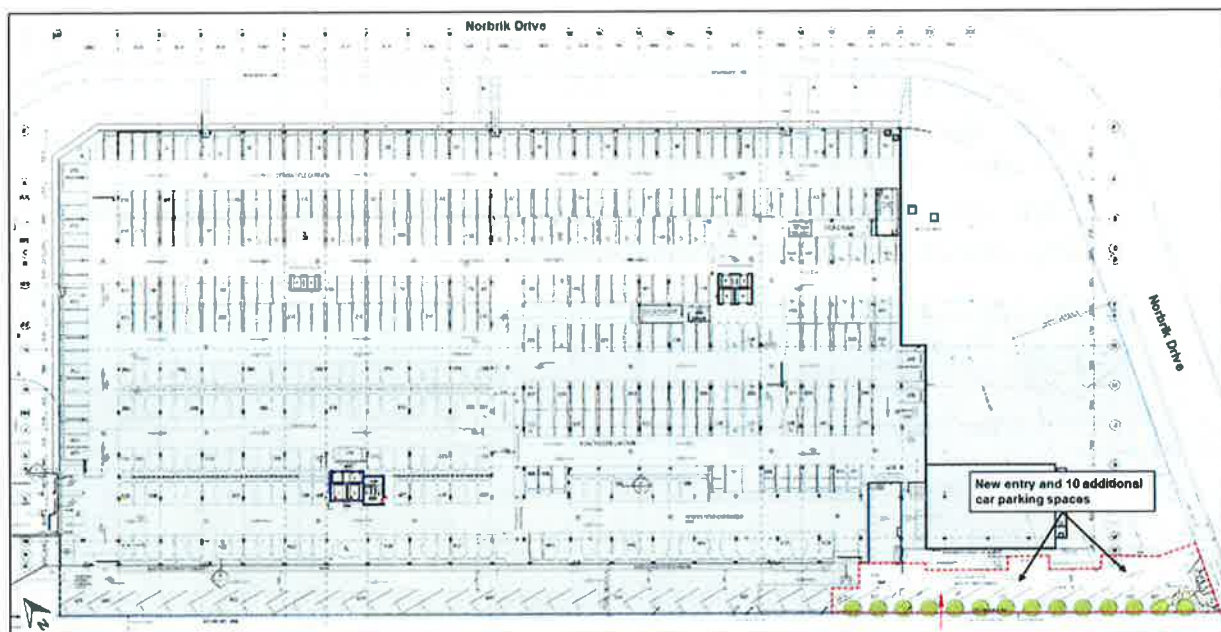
| Amended basement layout, new car parking and new entry point (Base source: Applicant's RtS)
